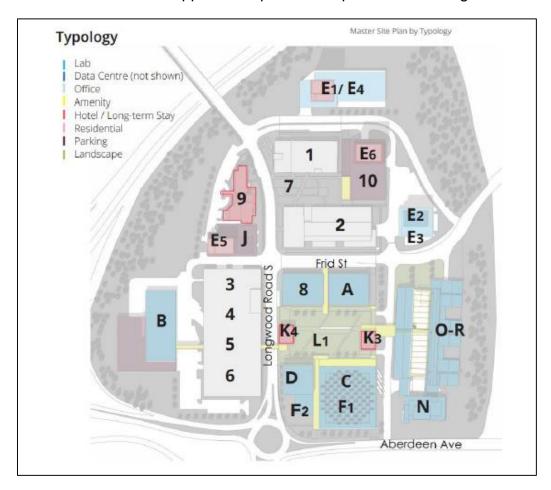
McMaster Innovation Park Master Plan – Building Typologies (from Refined Master Site Plan prepared by McCallum Sather)
